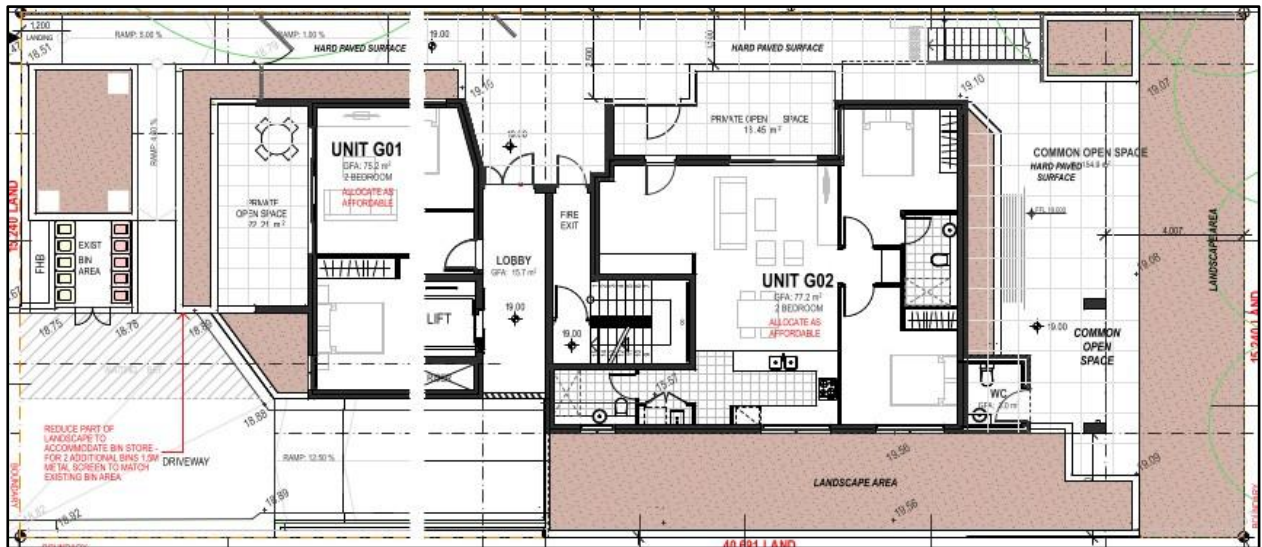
Proposed Ground Floor Plan under DA-166/2026 (Architectural Set).
